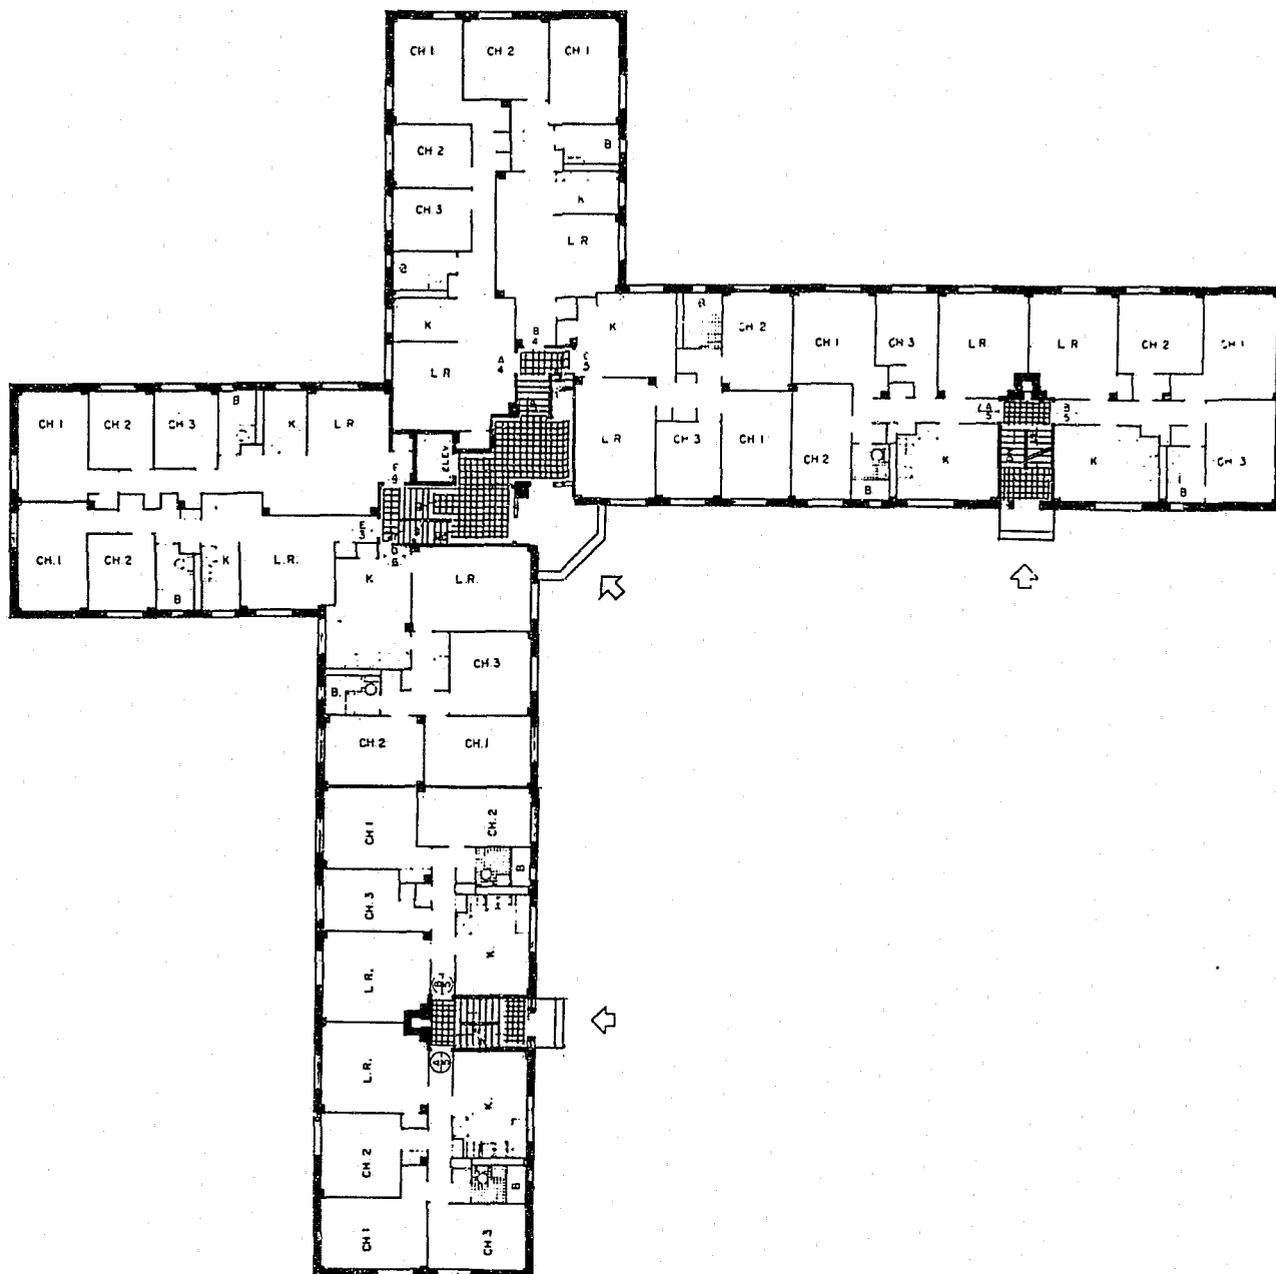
Brownsville Homes, New York. Floor plan.
